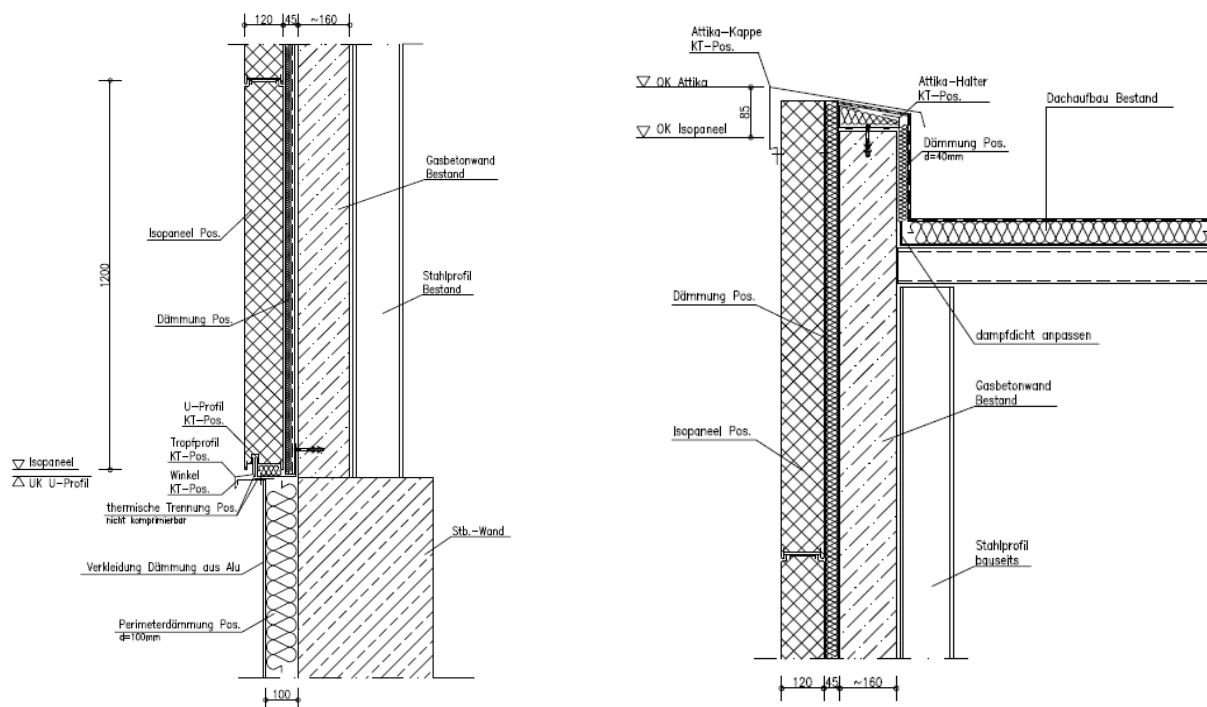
Details for use of steel sandwich panels for overcladding (left: base plate, right: attic)
